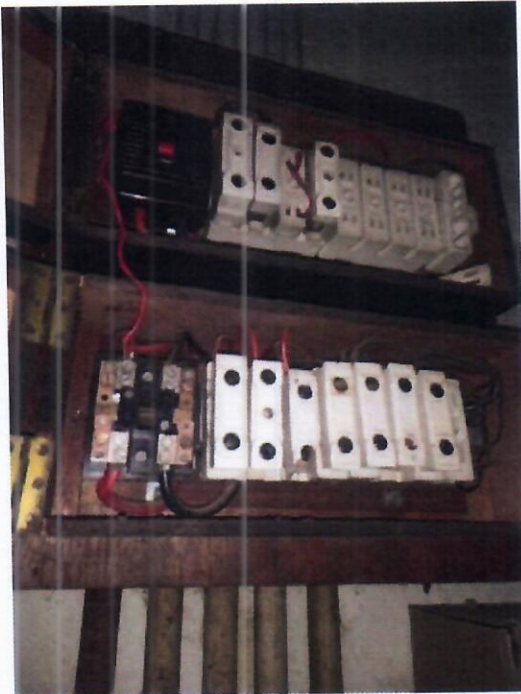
Consumer's Unit in Duct Supplying Power to Section of Ground Floor of Northern Wing of Main Building
